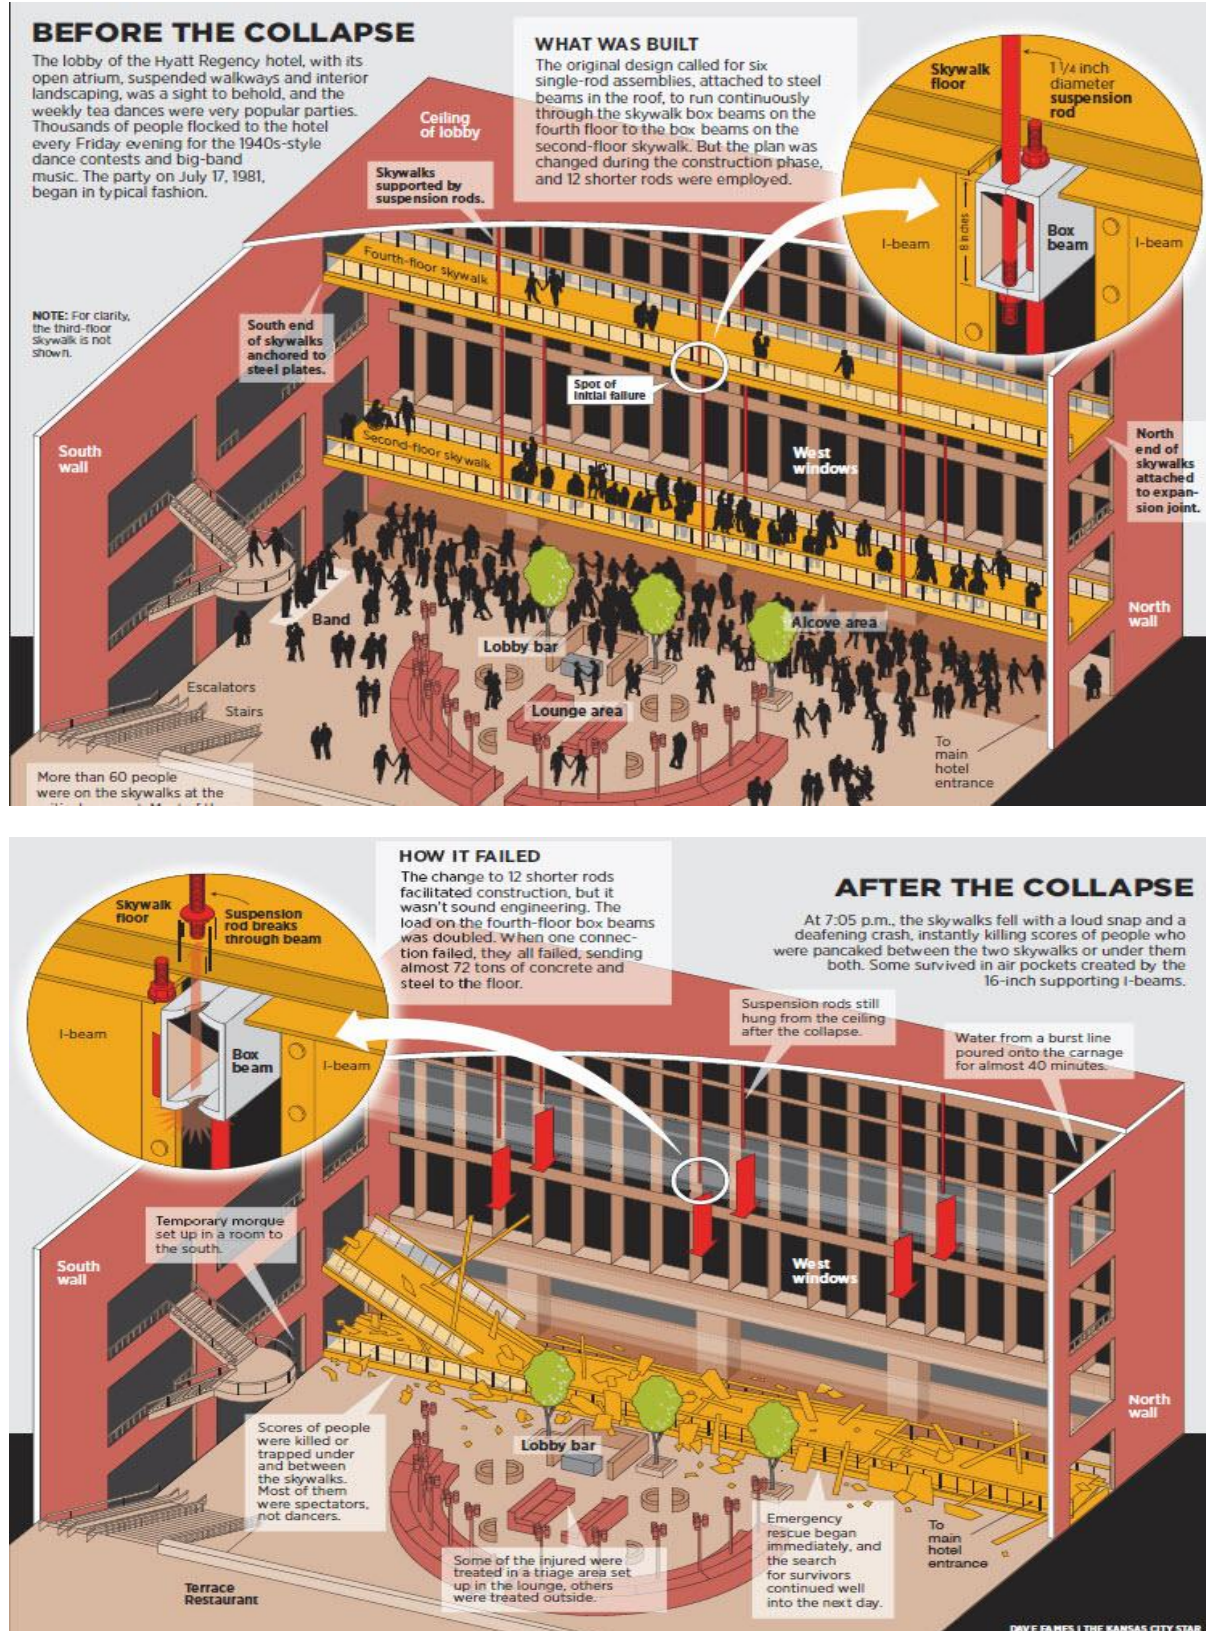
Diagram of the suspended walkway, before and after the collapse (Source Kansas City Star)
